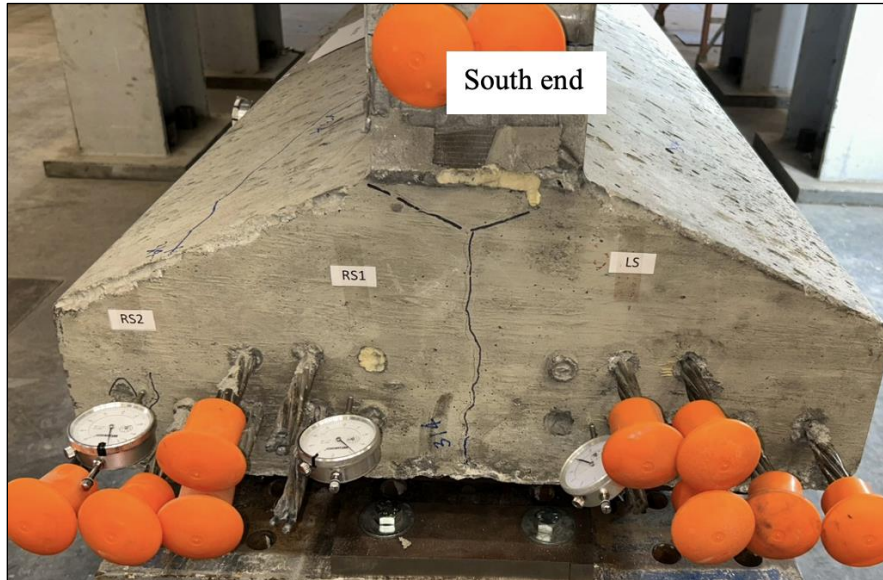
Photo. Test 4.2.S (repair 4.2RBZ, 4.2RTFE, 4.2RTF, 4.2LTF) south end section cracks at 314 kip.
